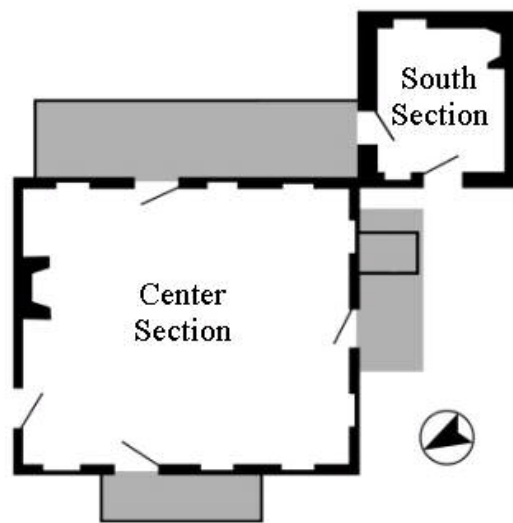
Floorplan of Hunsicker House c. 1834, following the construction of the center section.
